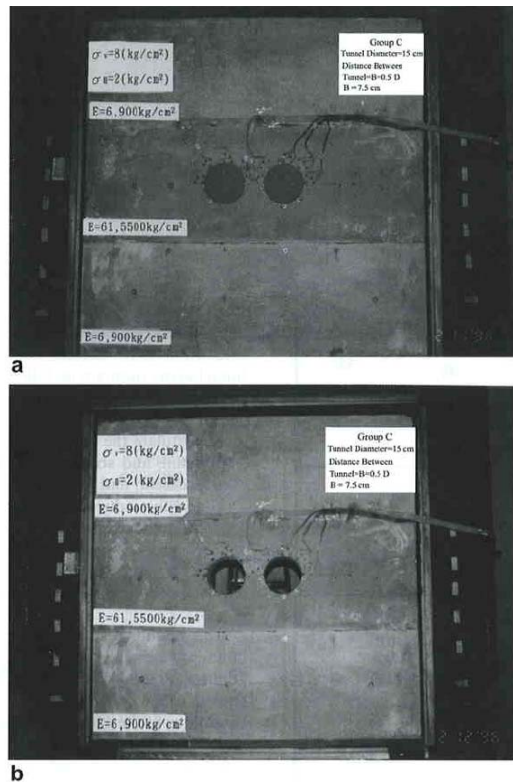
Model test of twin tunnels with instrumentations before (a) and after (b) excavation.
